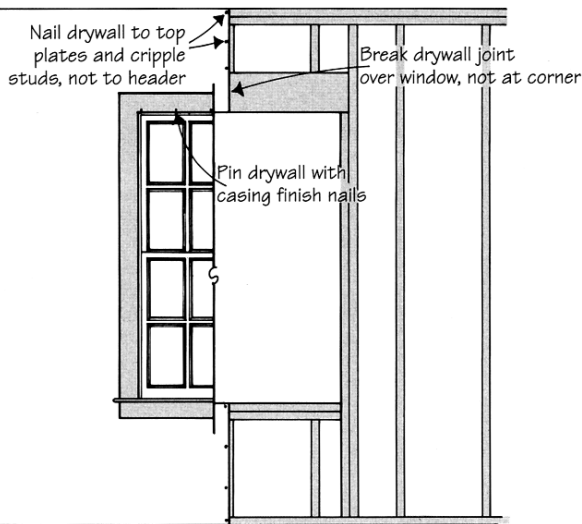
To prevent drywall joints from cracking at the corners of windows and doors, place the sheet so the joint falls in the center of the opening, and then cut out the waste. Also, do not fasten the drywall to the header, but use the interior casing to secure the loose edge of the drywall.
